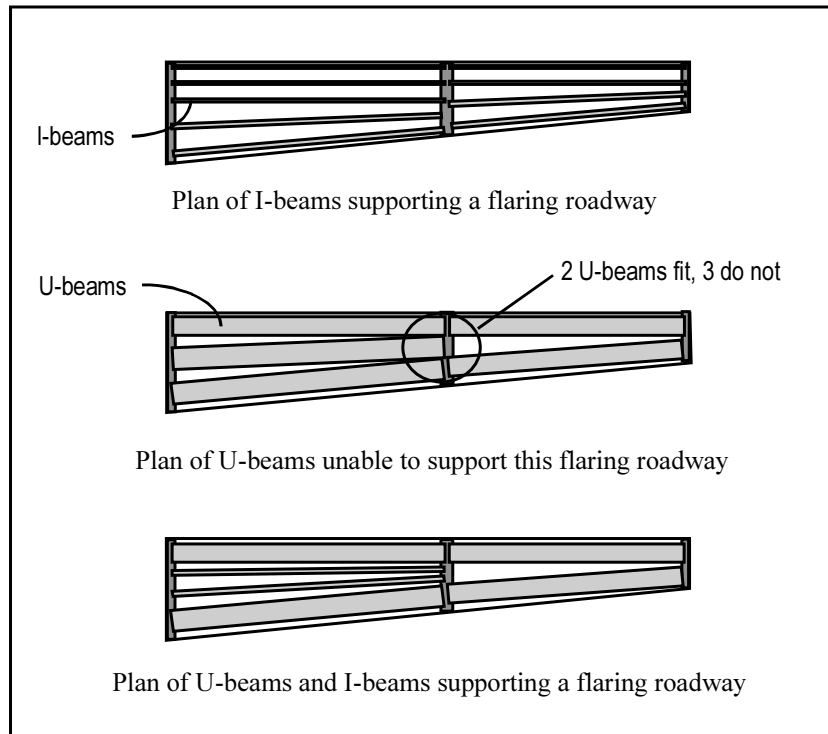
Accommodation of a flaring roadway with I-beams and U-beams
